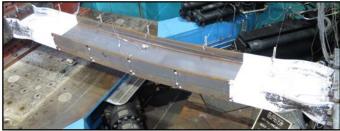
Failure modes of steel columns (Uang, Ozkula and Harris, 2015). W24×131 with P = 0.18Py.
